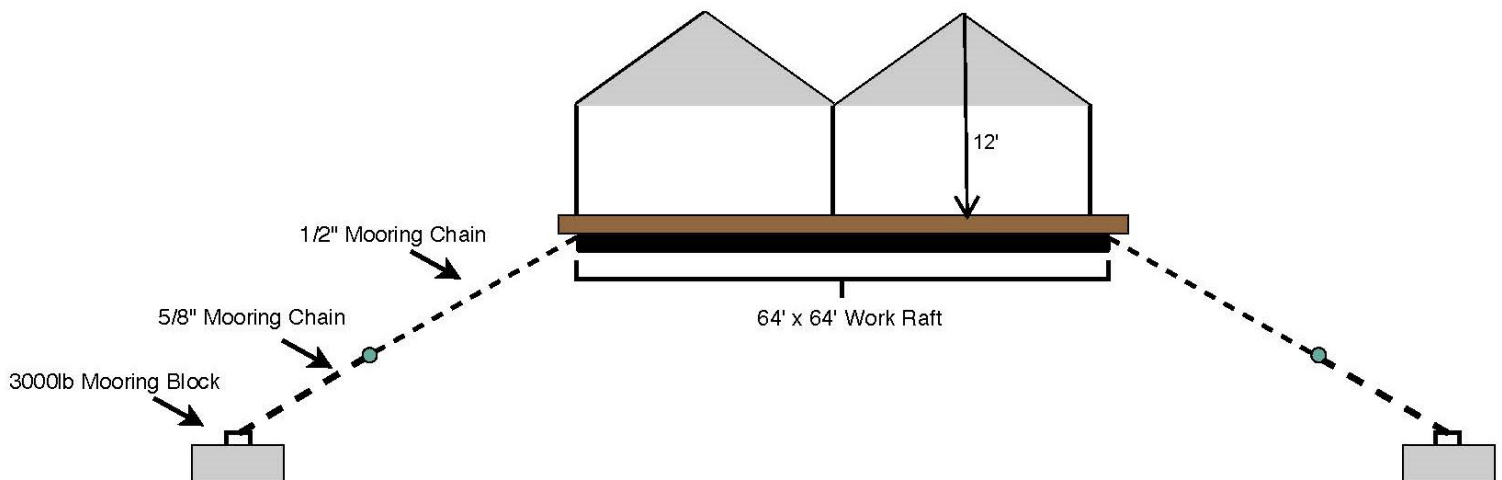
Schematic Cross Section of the float for Dodge Cove Marine Farm's proposal.
